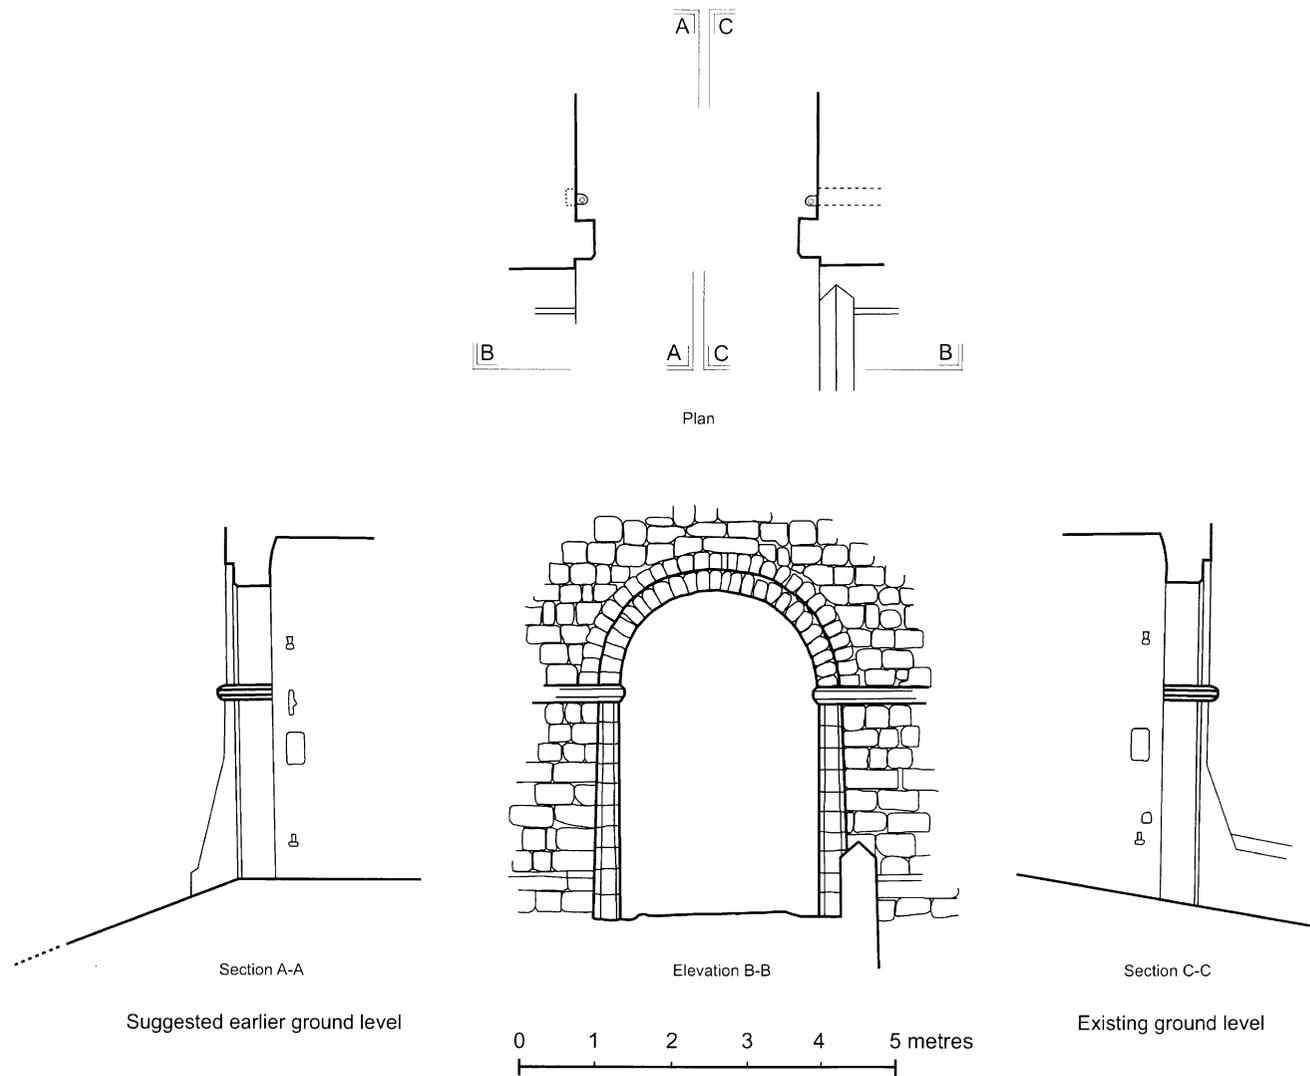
Plan and cross-section of the gatehouse southern arch and jambs where the gates now hang (1:100).
